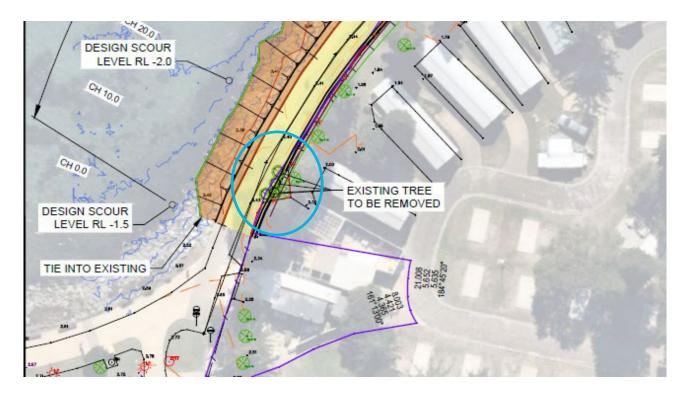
Proposed plan of southern breakwall remediation works and upgrades. Source: Royal Haskoning DHV drawing number PA2696-RHD-00-00-DR-ME-1001
